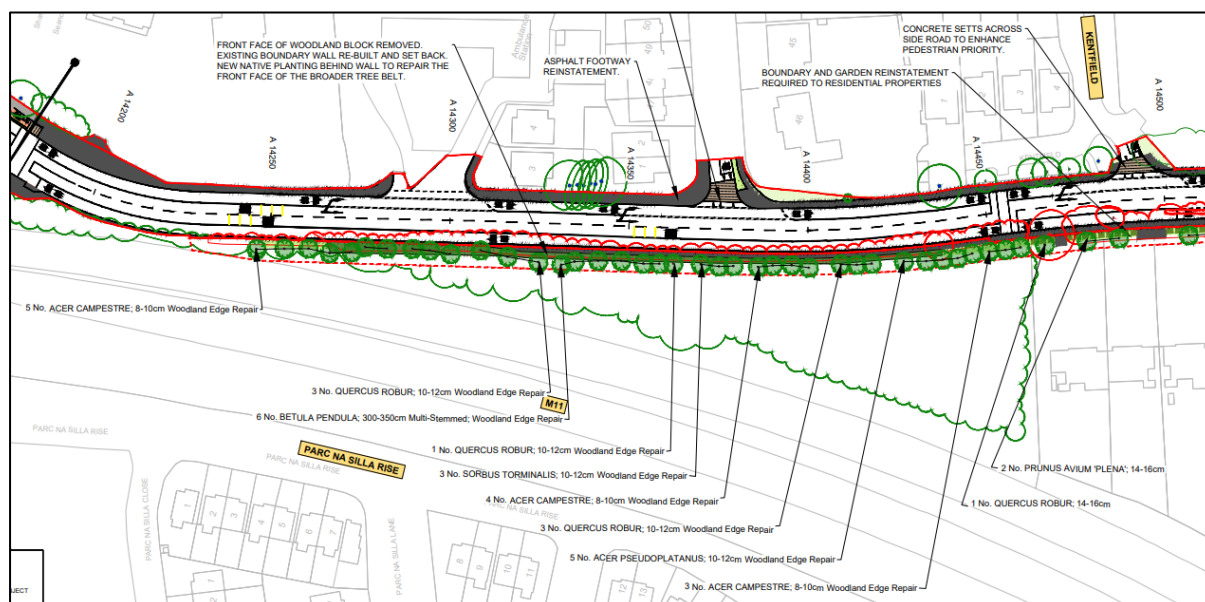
Extract from Landscape General Arrangement Drawings (Sheet 41)
